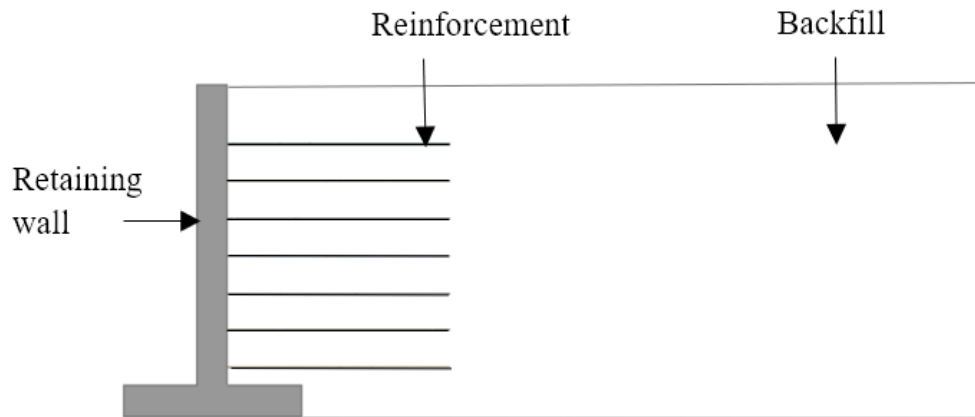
Representation of a mechanically stabilized earth retaining wall
